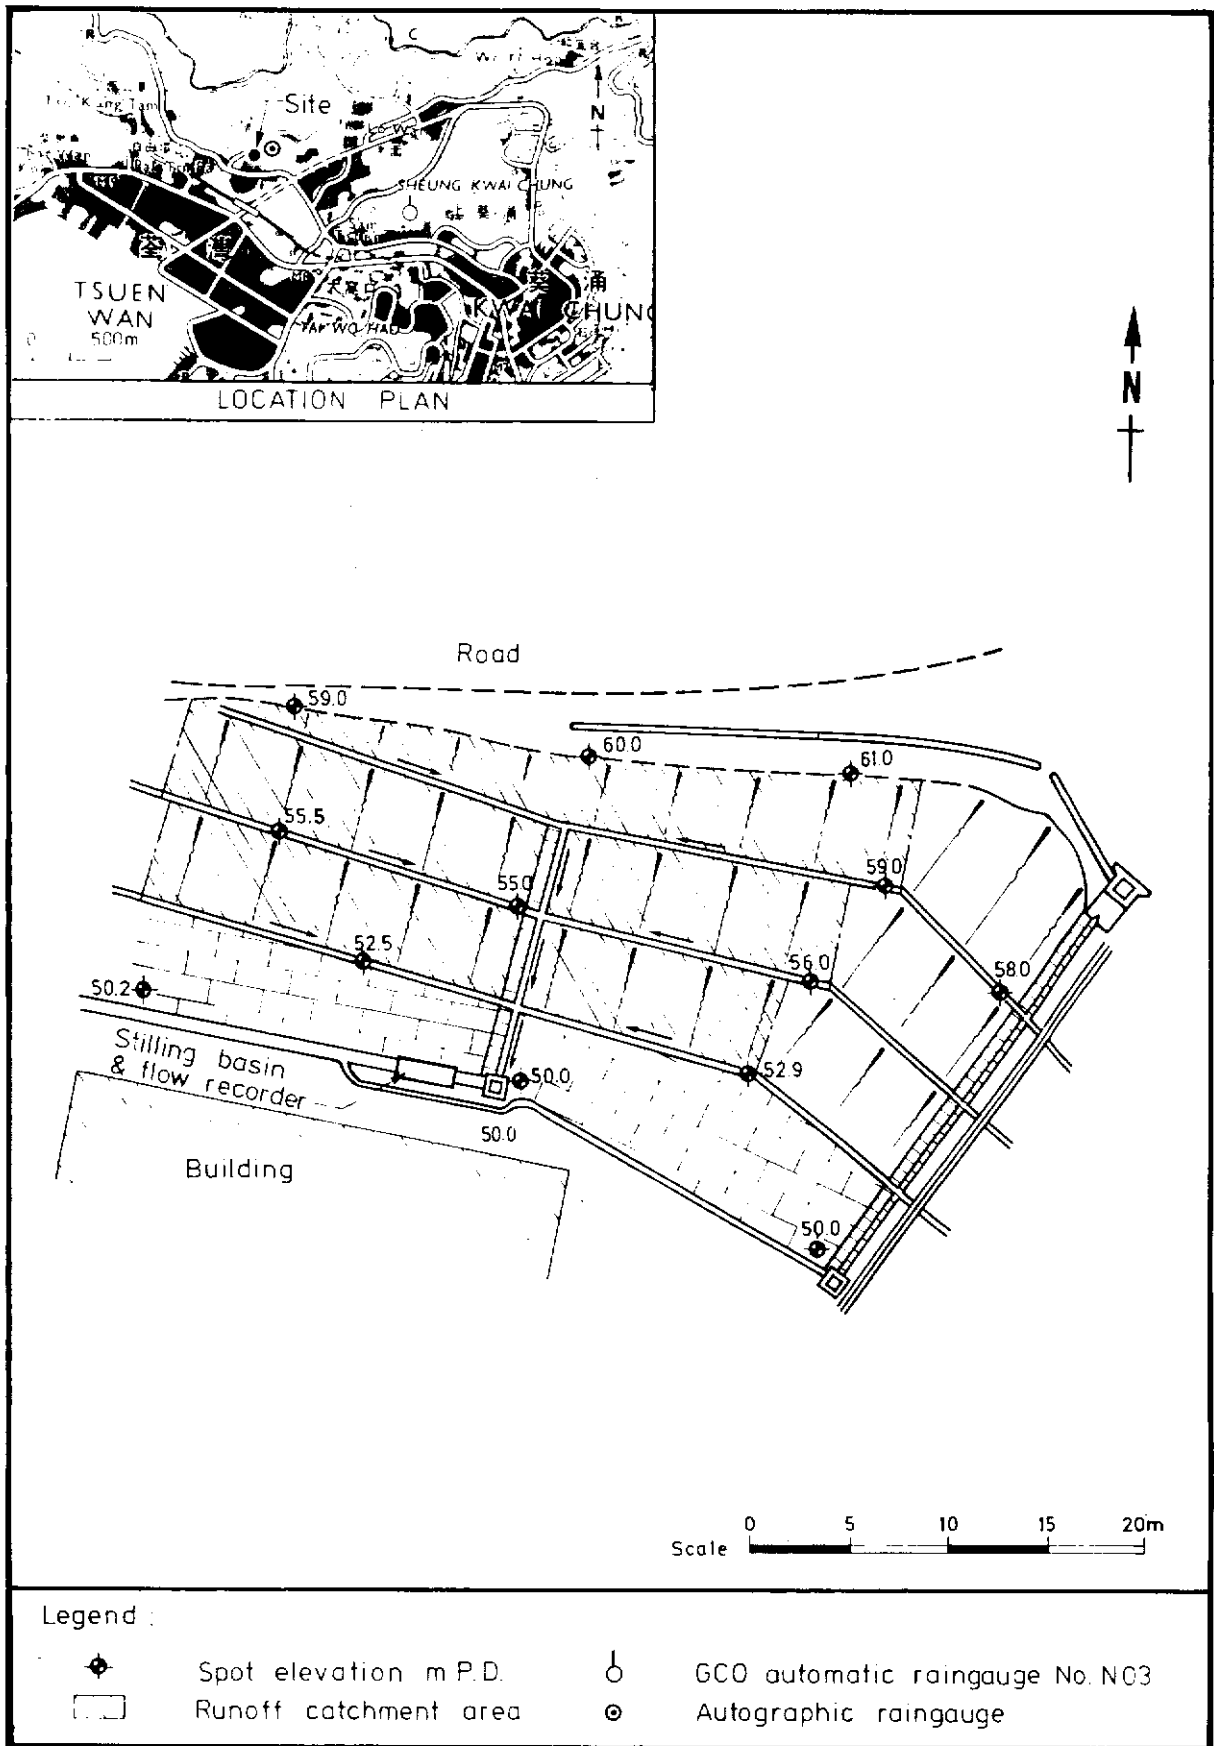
Site Plan for the Runoff Plot at Tsuen Wan (TWA)
